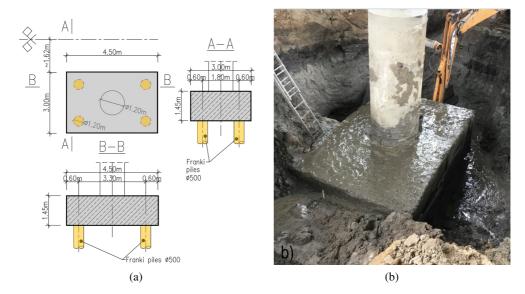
Geometry of existing foundations (a) and the exposure of a pile cap (b)
